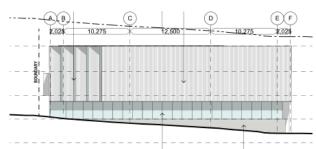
Proposed south elevation Source: Lahznimmo Architects
